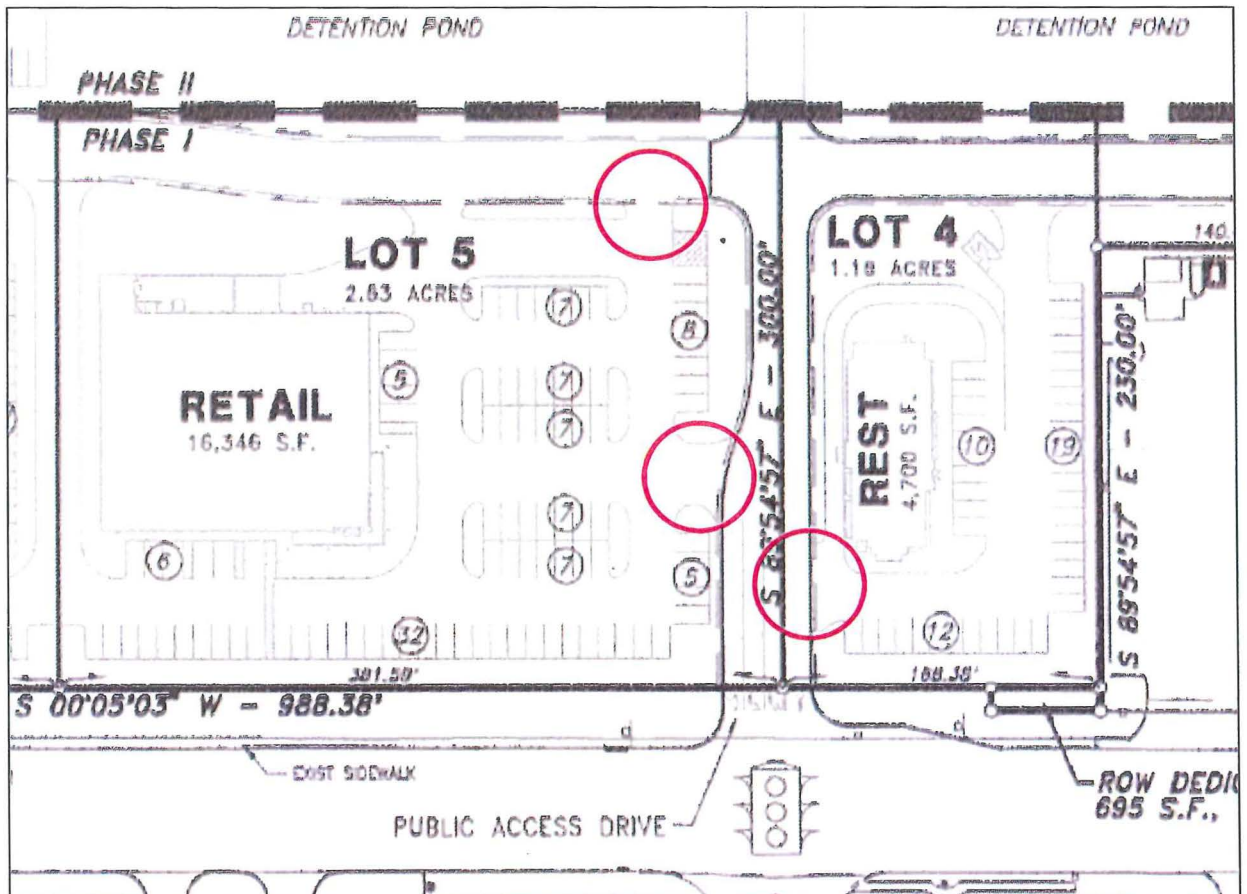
Driveway locations not approved (red circles) – to be reviewed with building permit submittal.
